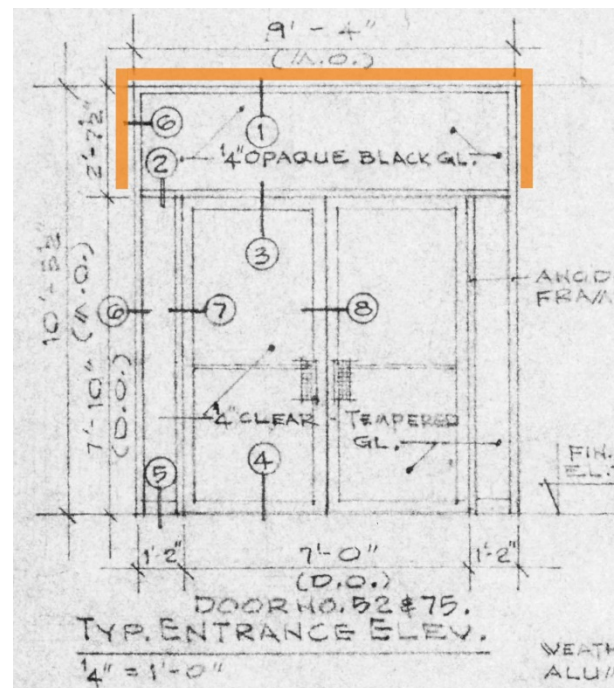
Typical one-story exterior door assembly elevation. Orange lines indicate locations of exterior and interior caulk to be removed and replaced.
